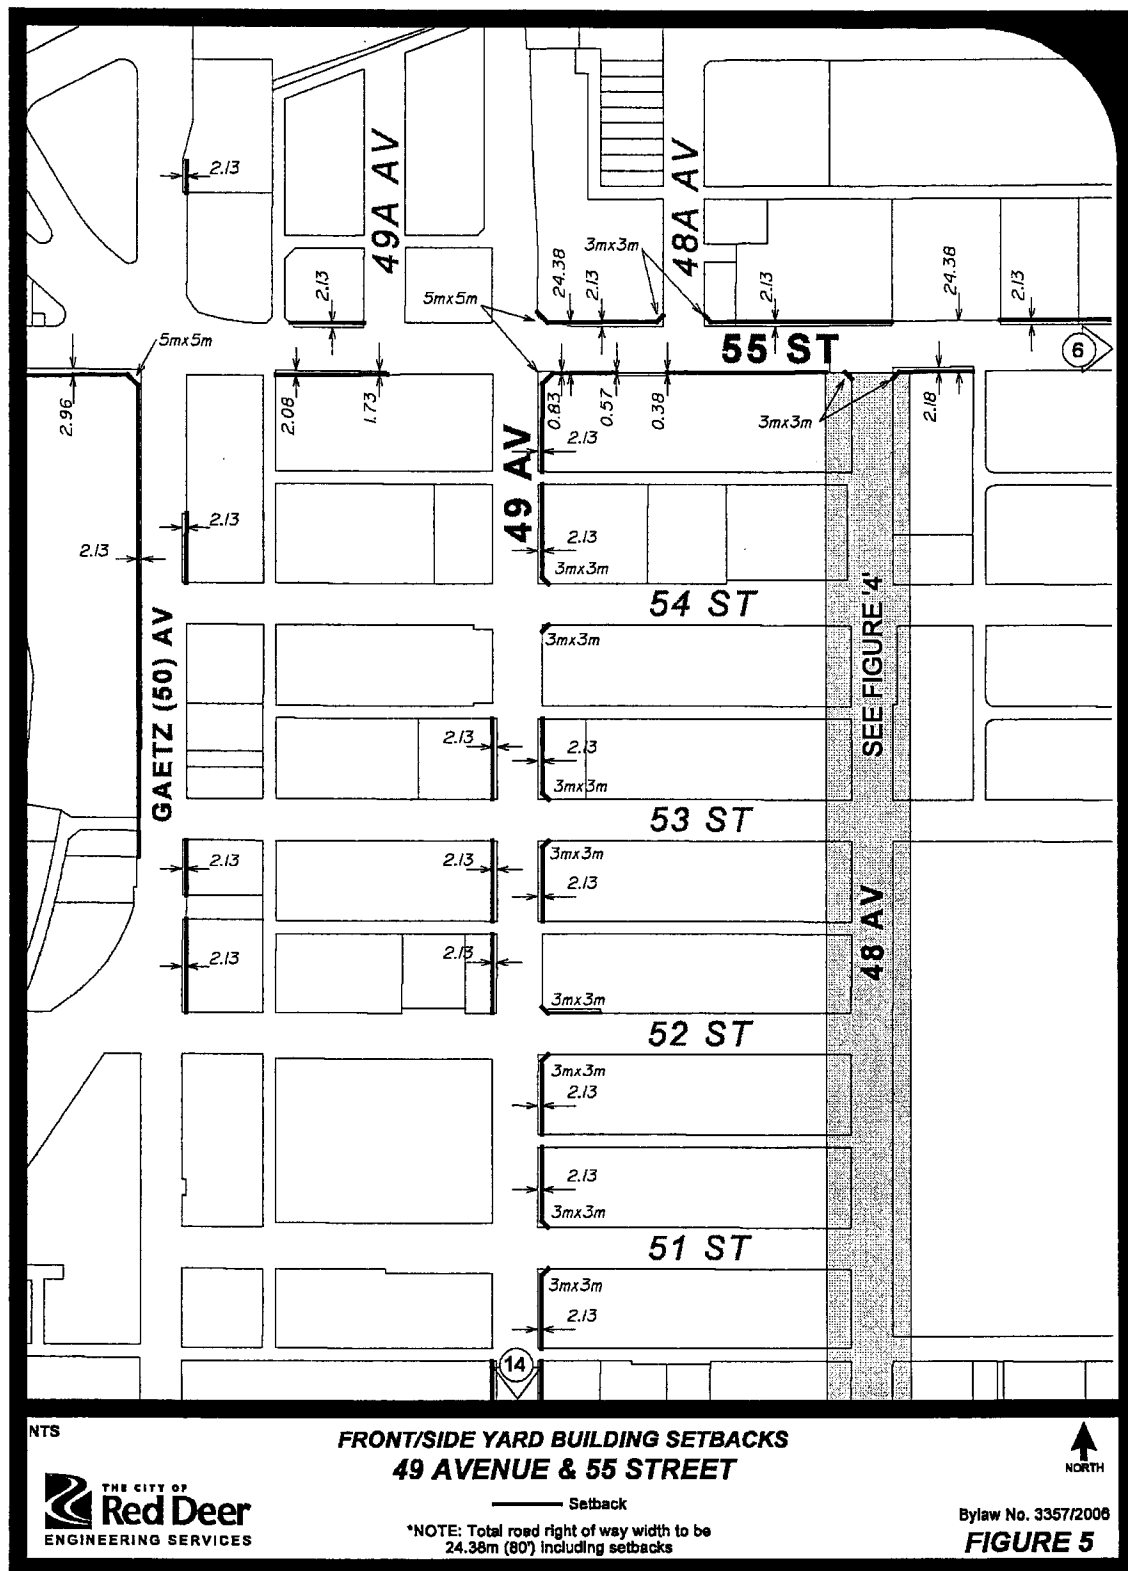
Front/Side Yard Building Setbacks 49th Avenue & 55 Street
